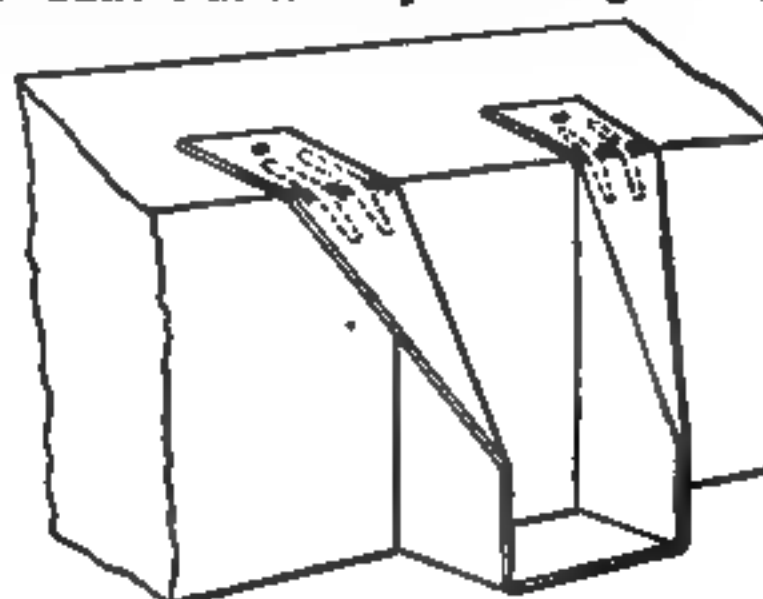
Duplex Wall-hanger for Concrete Blocks
